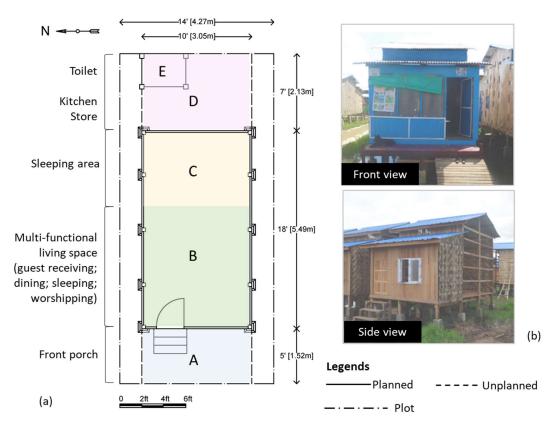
Initial design of CLH in site-1 (a) floor plan; (b) building form of areas B and C
